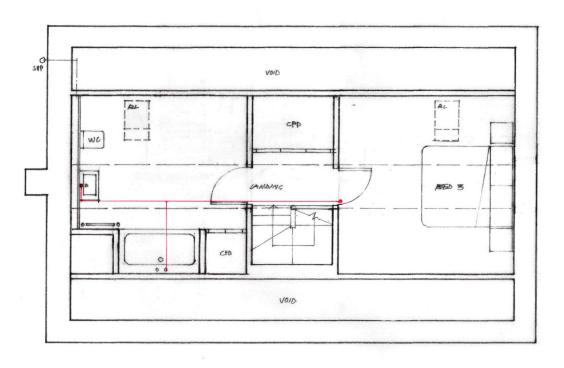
Attic Floor Plan. Drawing by Lacey Interior Architecture Ltd.
